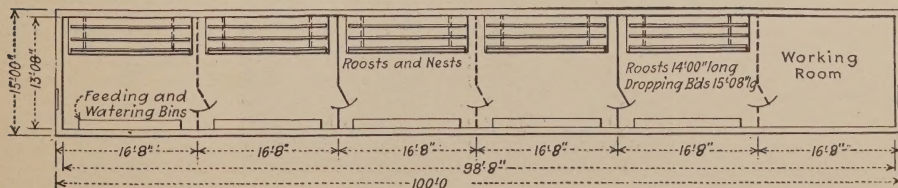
Floor plan for chicken house with workroom and five rooms for fowls.
